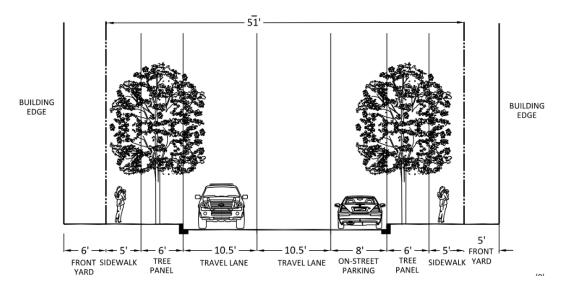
Private Street B With On-Street Parking At Rear Load Townhouses
